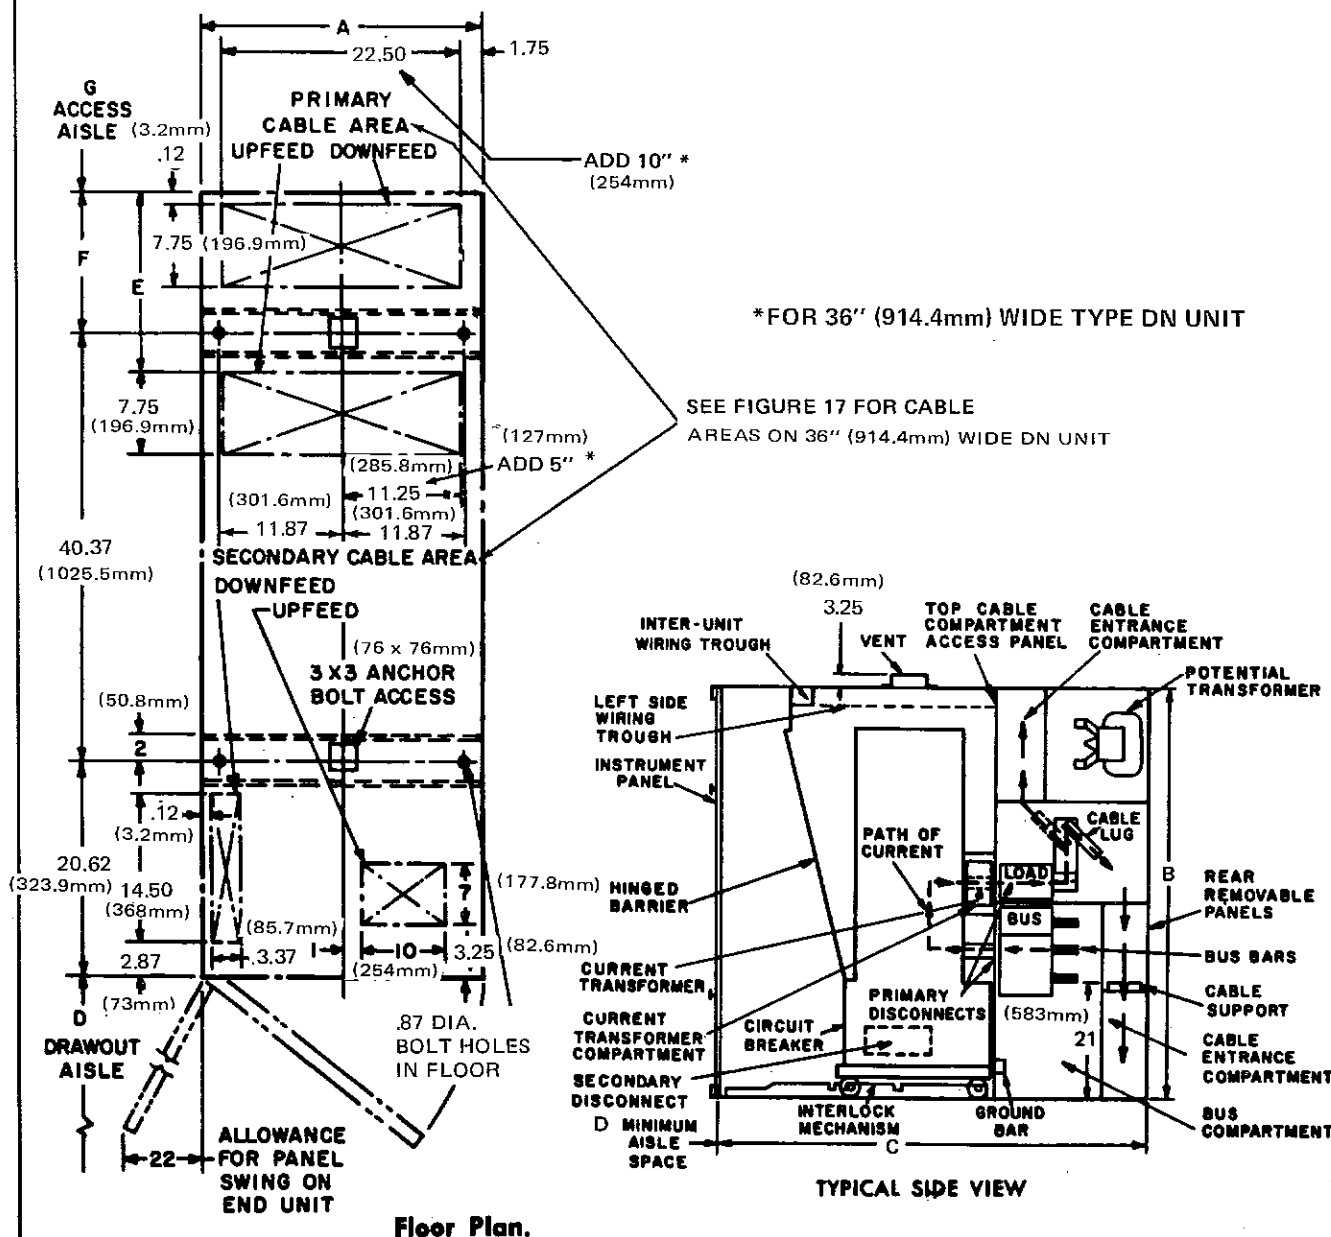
Floor Plan and Typical Side View of 5 kV Indoor Cubicles
